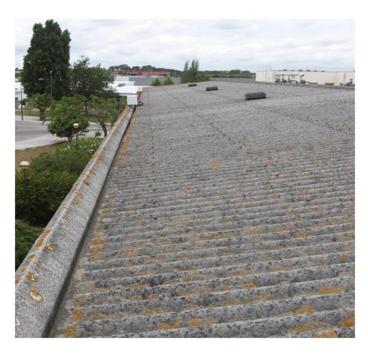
Building I roof, consisting of tile cement. Building II roof is identical.
